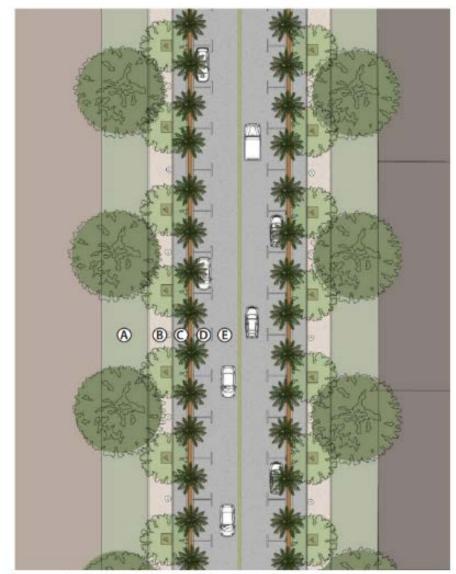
Plan View of a Typical Diagram for the Green Corridors / Complete Streets
